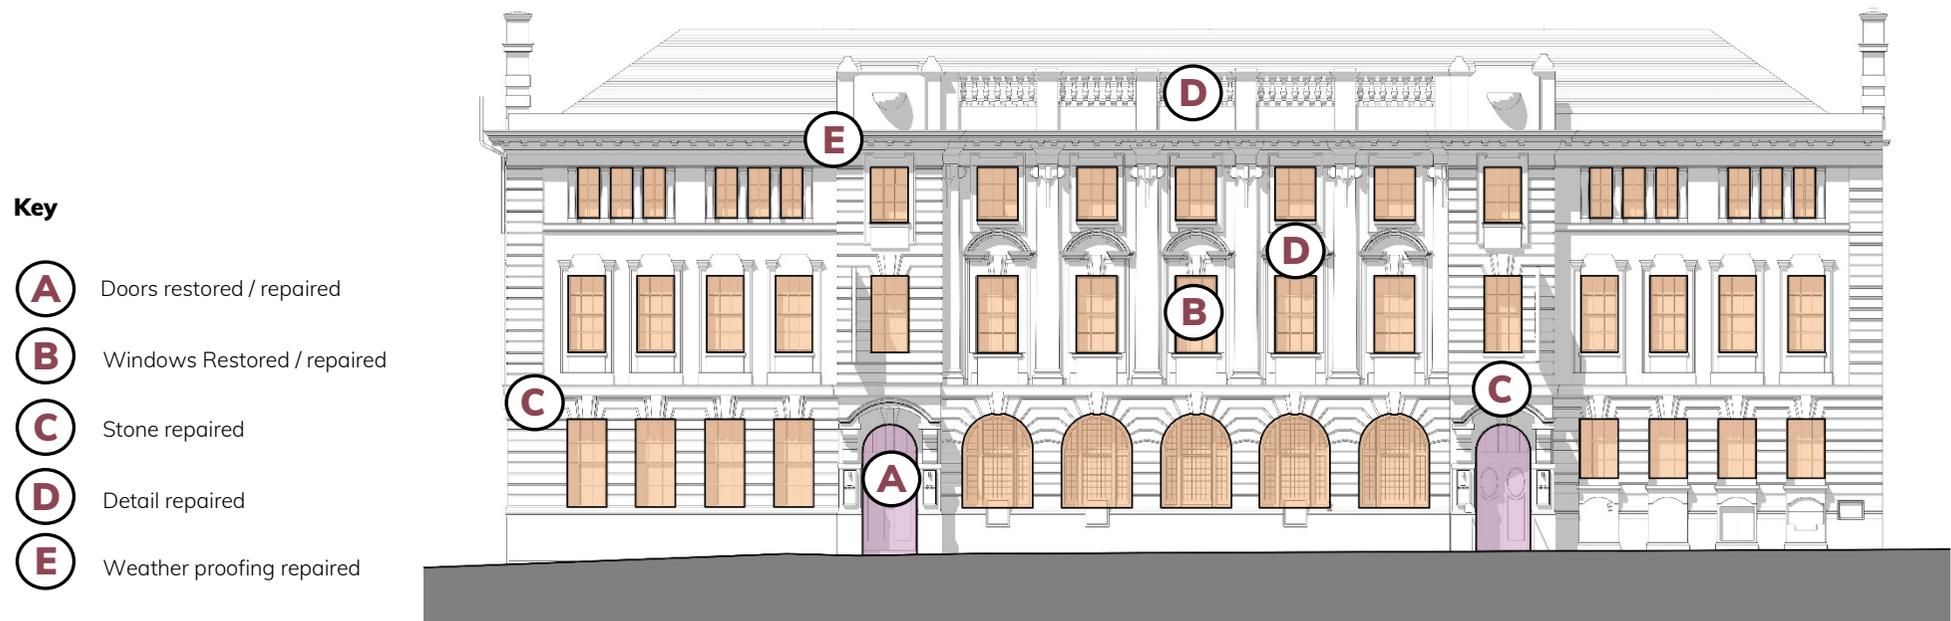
Proposed Restoration, Abingdon Street Façade, Post Office
